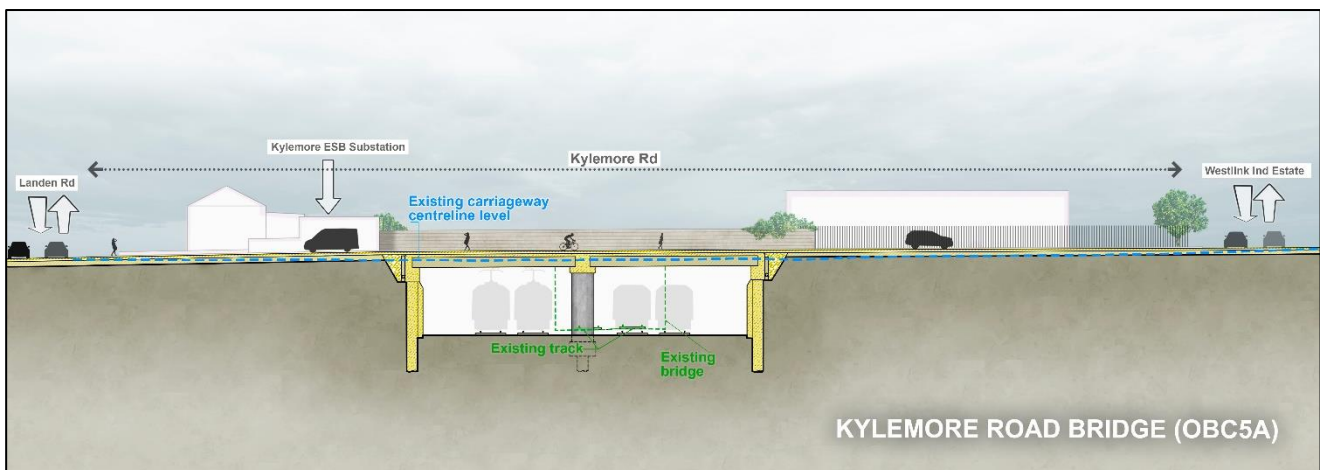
Emerging Preferred Option for the Kylemore Road Bridge (OBC5A)
